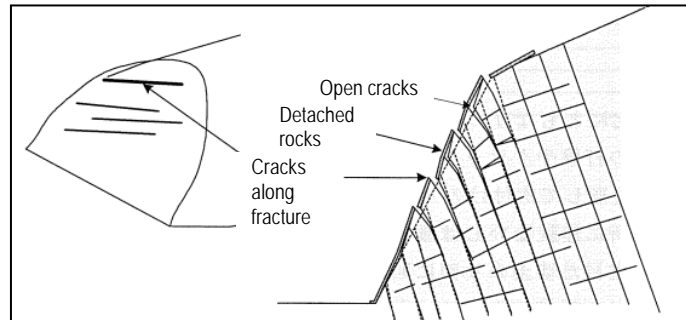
Example of Points to be Checked for Rock Slope Failure
